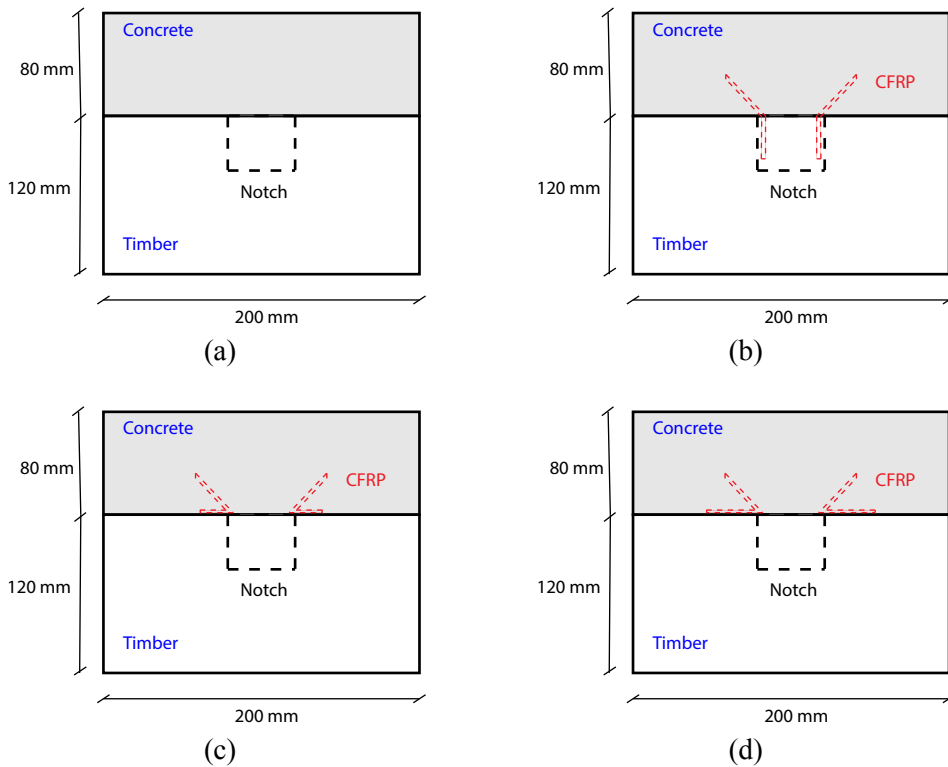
Schematics of tested specimens (a) C-N, (b) 40-N, (c) 40-NN, and (d) 60-NN.
